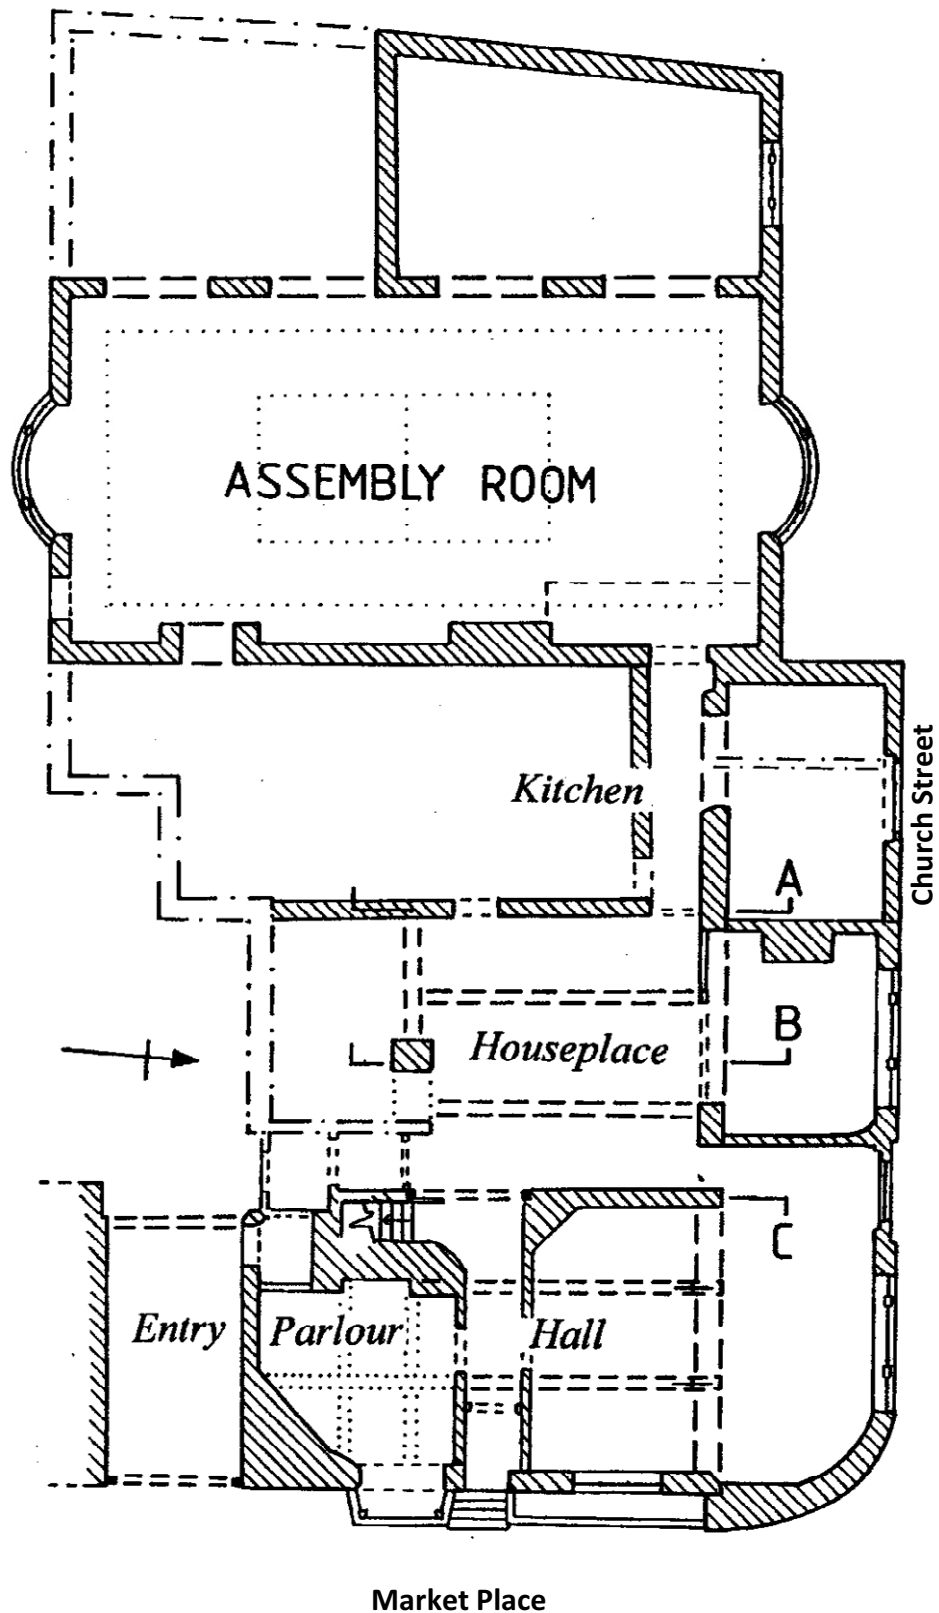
Basic plan at ground-floor level to show layout and truss positions (after Faith Cleverdon)
